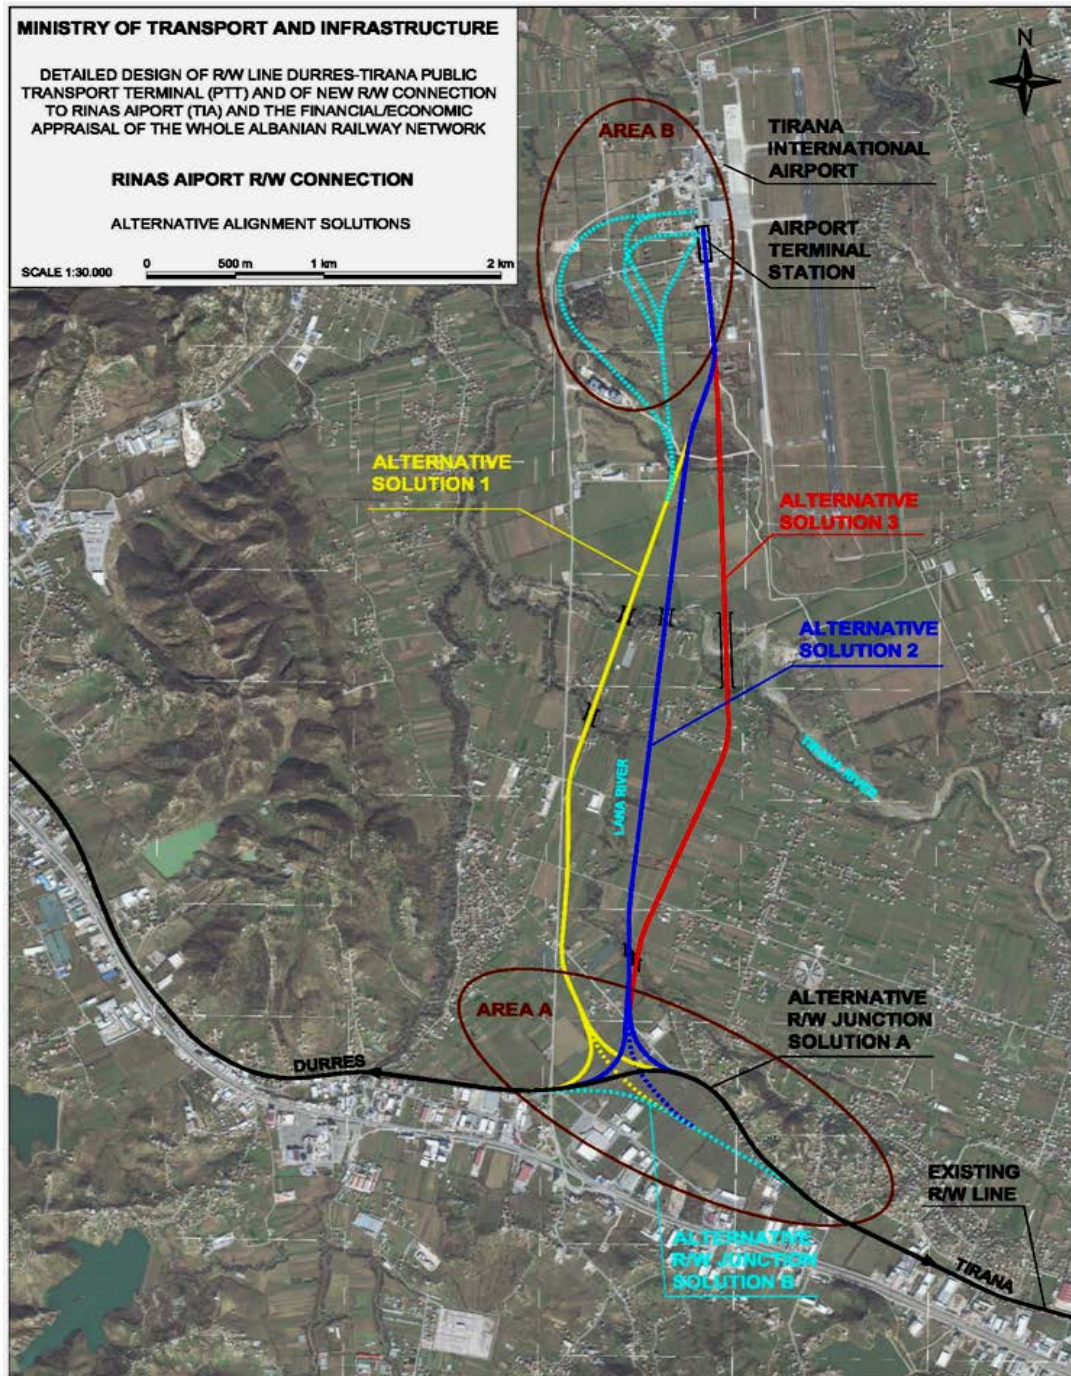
Rinas Airport railway connection alternative alignments. Alternative alignment 2 is the proposed solution
